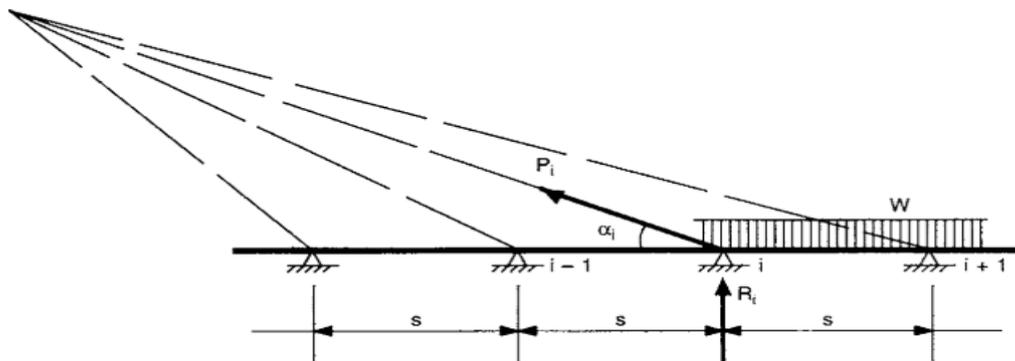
Cable-stayed girder continuous supported beam (Brockenbrough & Merritt, 2011)
